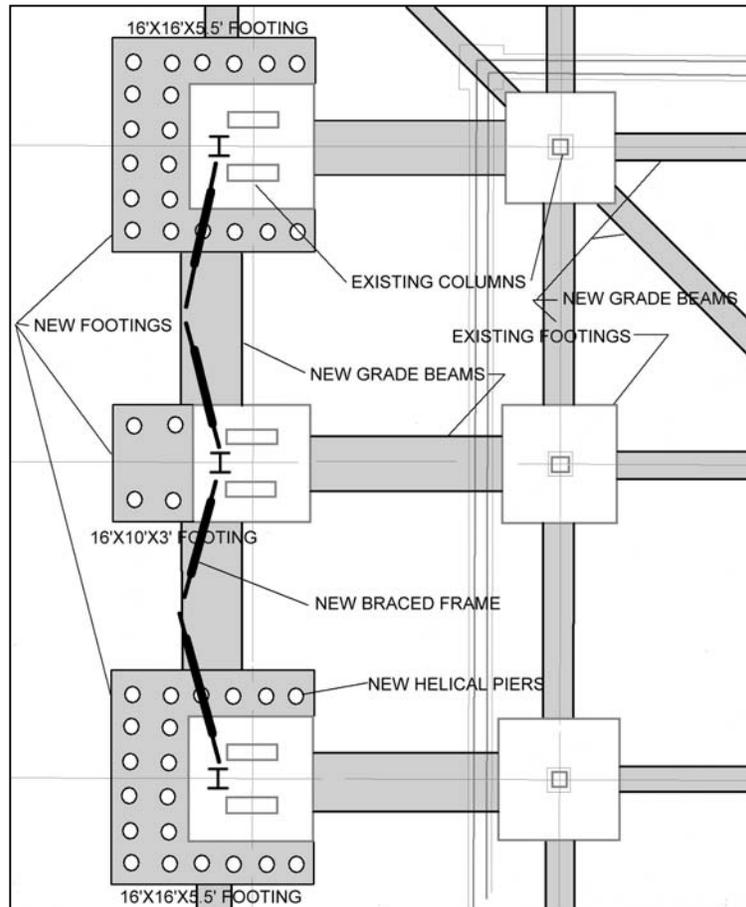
Schematic Representation of Typical Footings and Foundations for New Unbonded Braced Frames.
